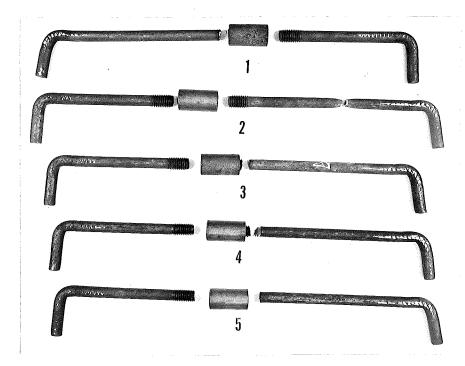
Failure photograph of No. 2 type hook bolts showing that 4 of the 5 specimens failed at a cross-section through the threaded portion of the bar and just outside the coupling sleeve.
